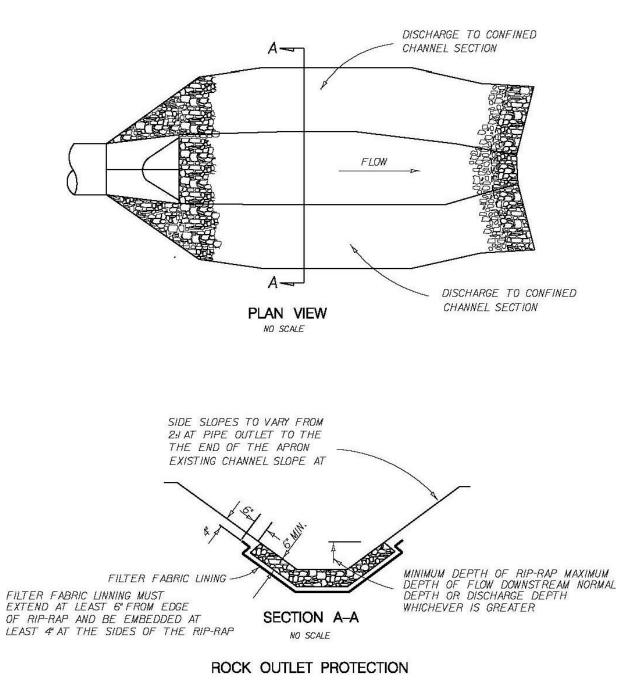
Structures Used For Outlet Protection by Dissipating Energy
